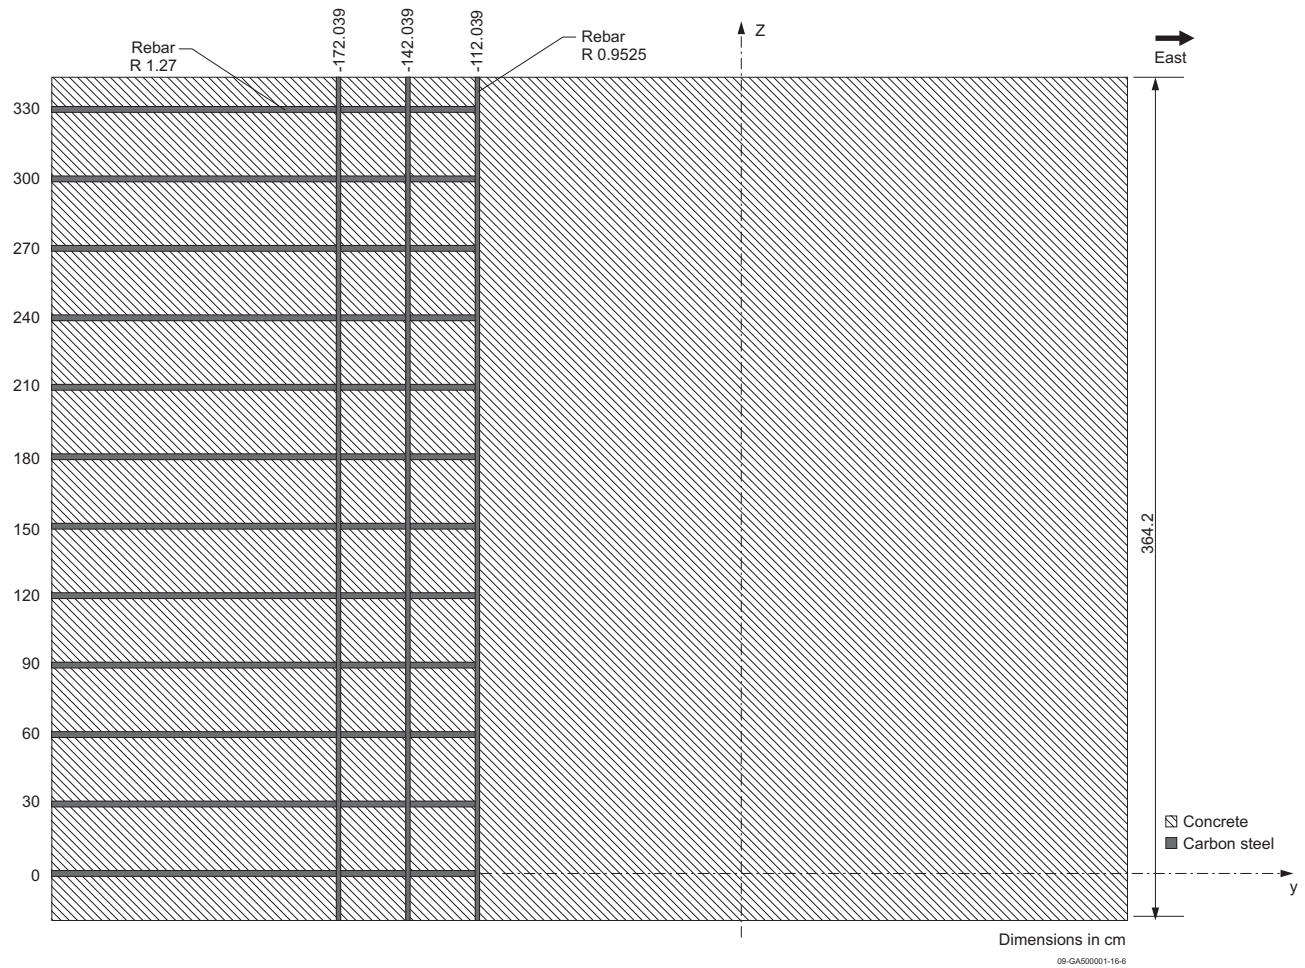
Detailed Model, South Wall Showing Rebar Positions.
